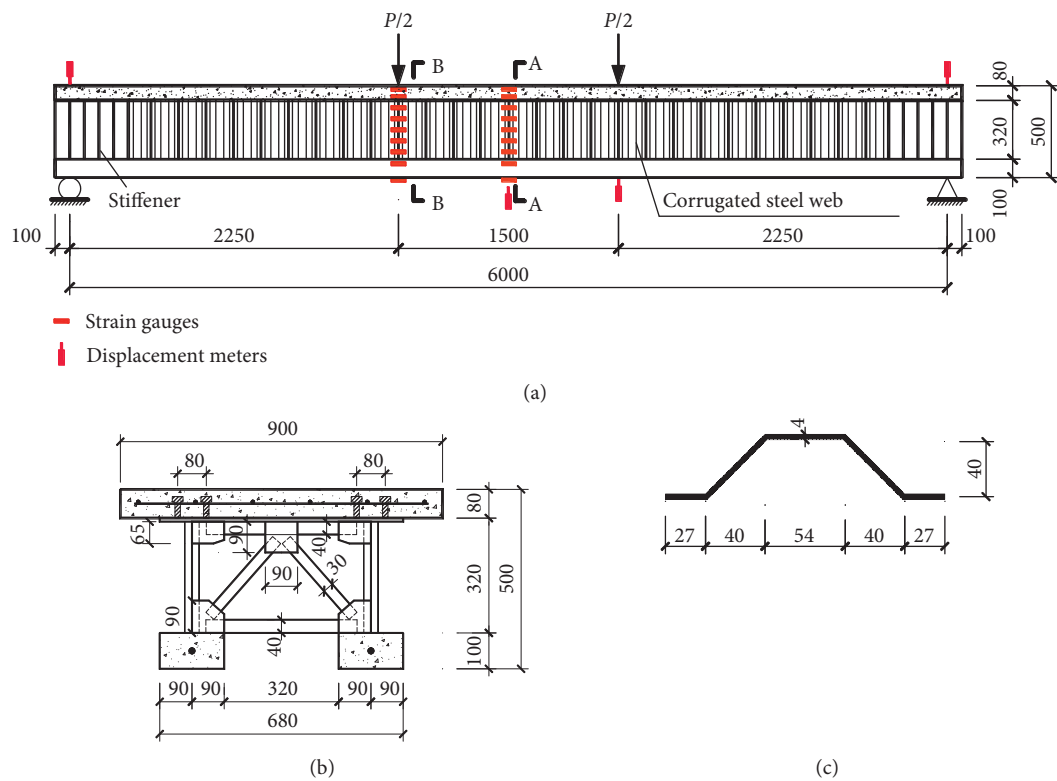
Design of the test specimen. (a) Dimensions and geometry of beam. (b) Sections A-A and B-B. (c) Details of corrugation profile.
